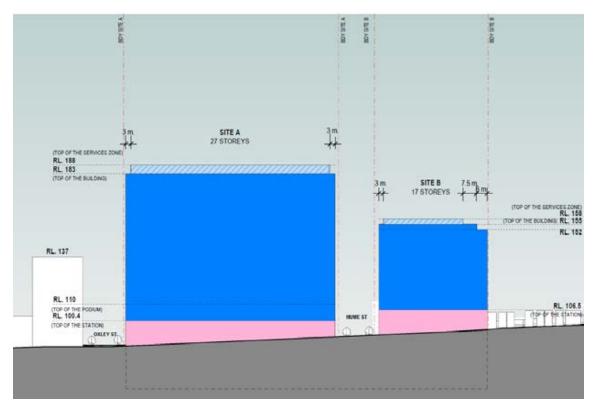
The proposed building envelope for Sites A and B (south-east elevation, Pacific Highway)
